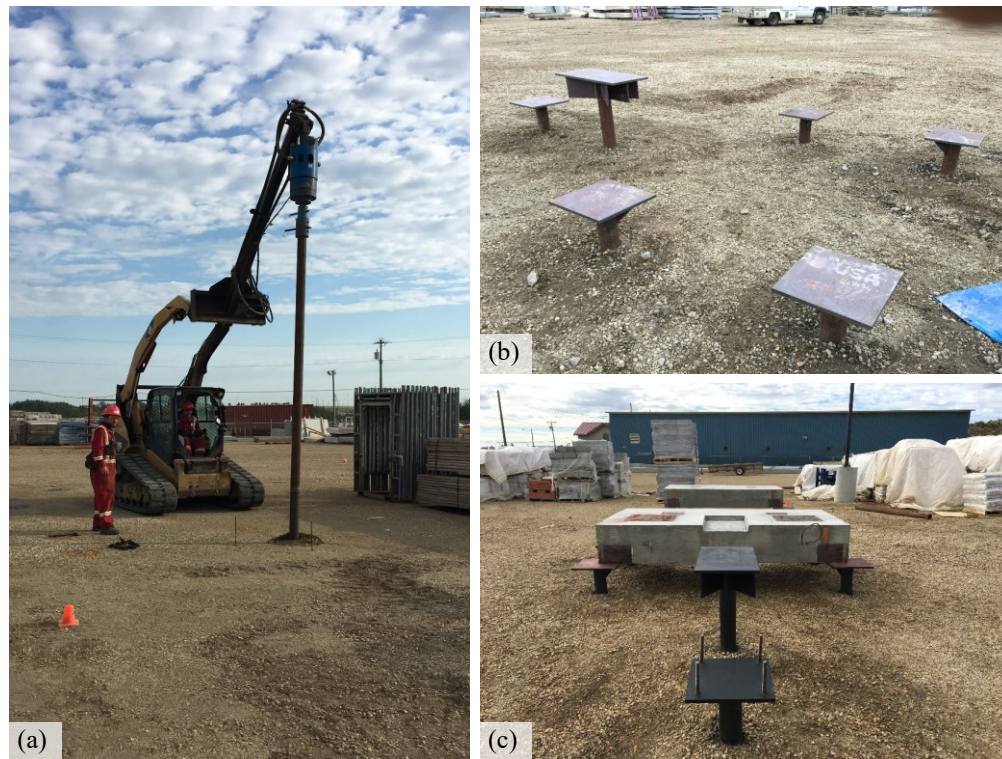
Foundation system for the test setup (a) Installation of screw piles (b) Pile caps installed and aligned (c) Precast slabs placed on top of the pile caps.
